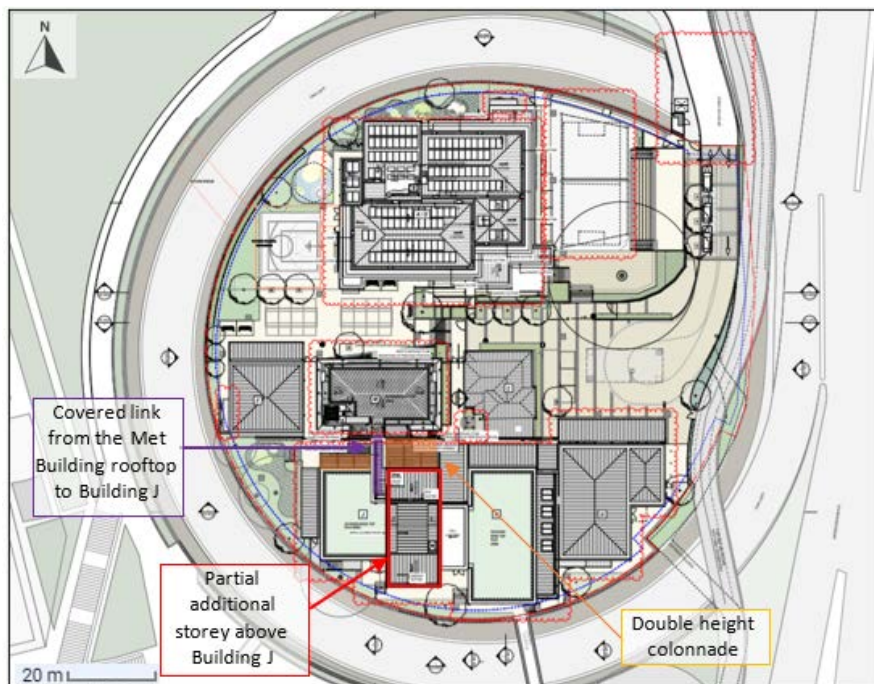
| Proposed amended site plan as originally lodged (Base source: Modification report 2021)
